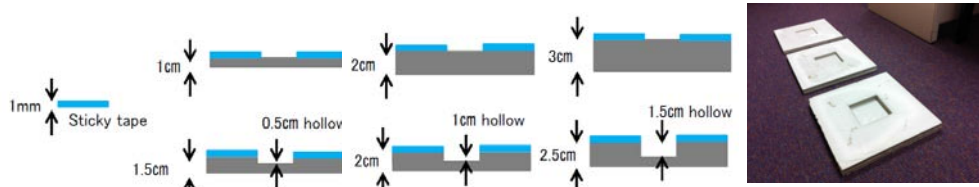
Concrete test pieces (right picture is test pieces have hollow)
